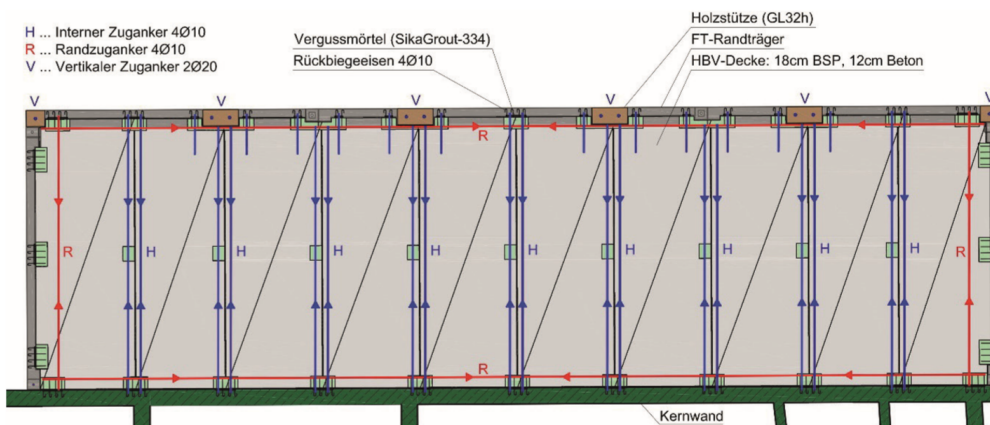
Illustration of vertical connection between the glulam columns and the edge beam in the HoHo Vienna building (Woschitz and Zotter, 2017). Image © RWT plus ZT GmbH
